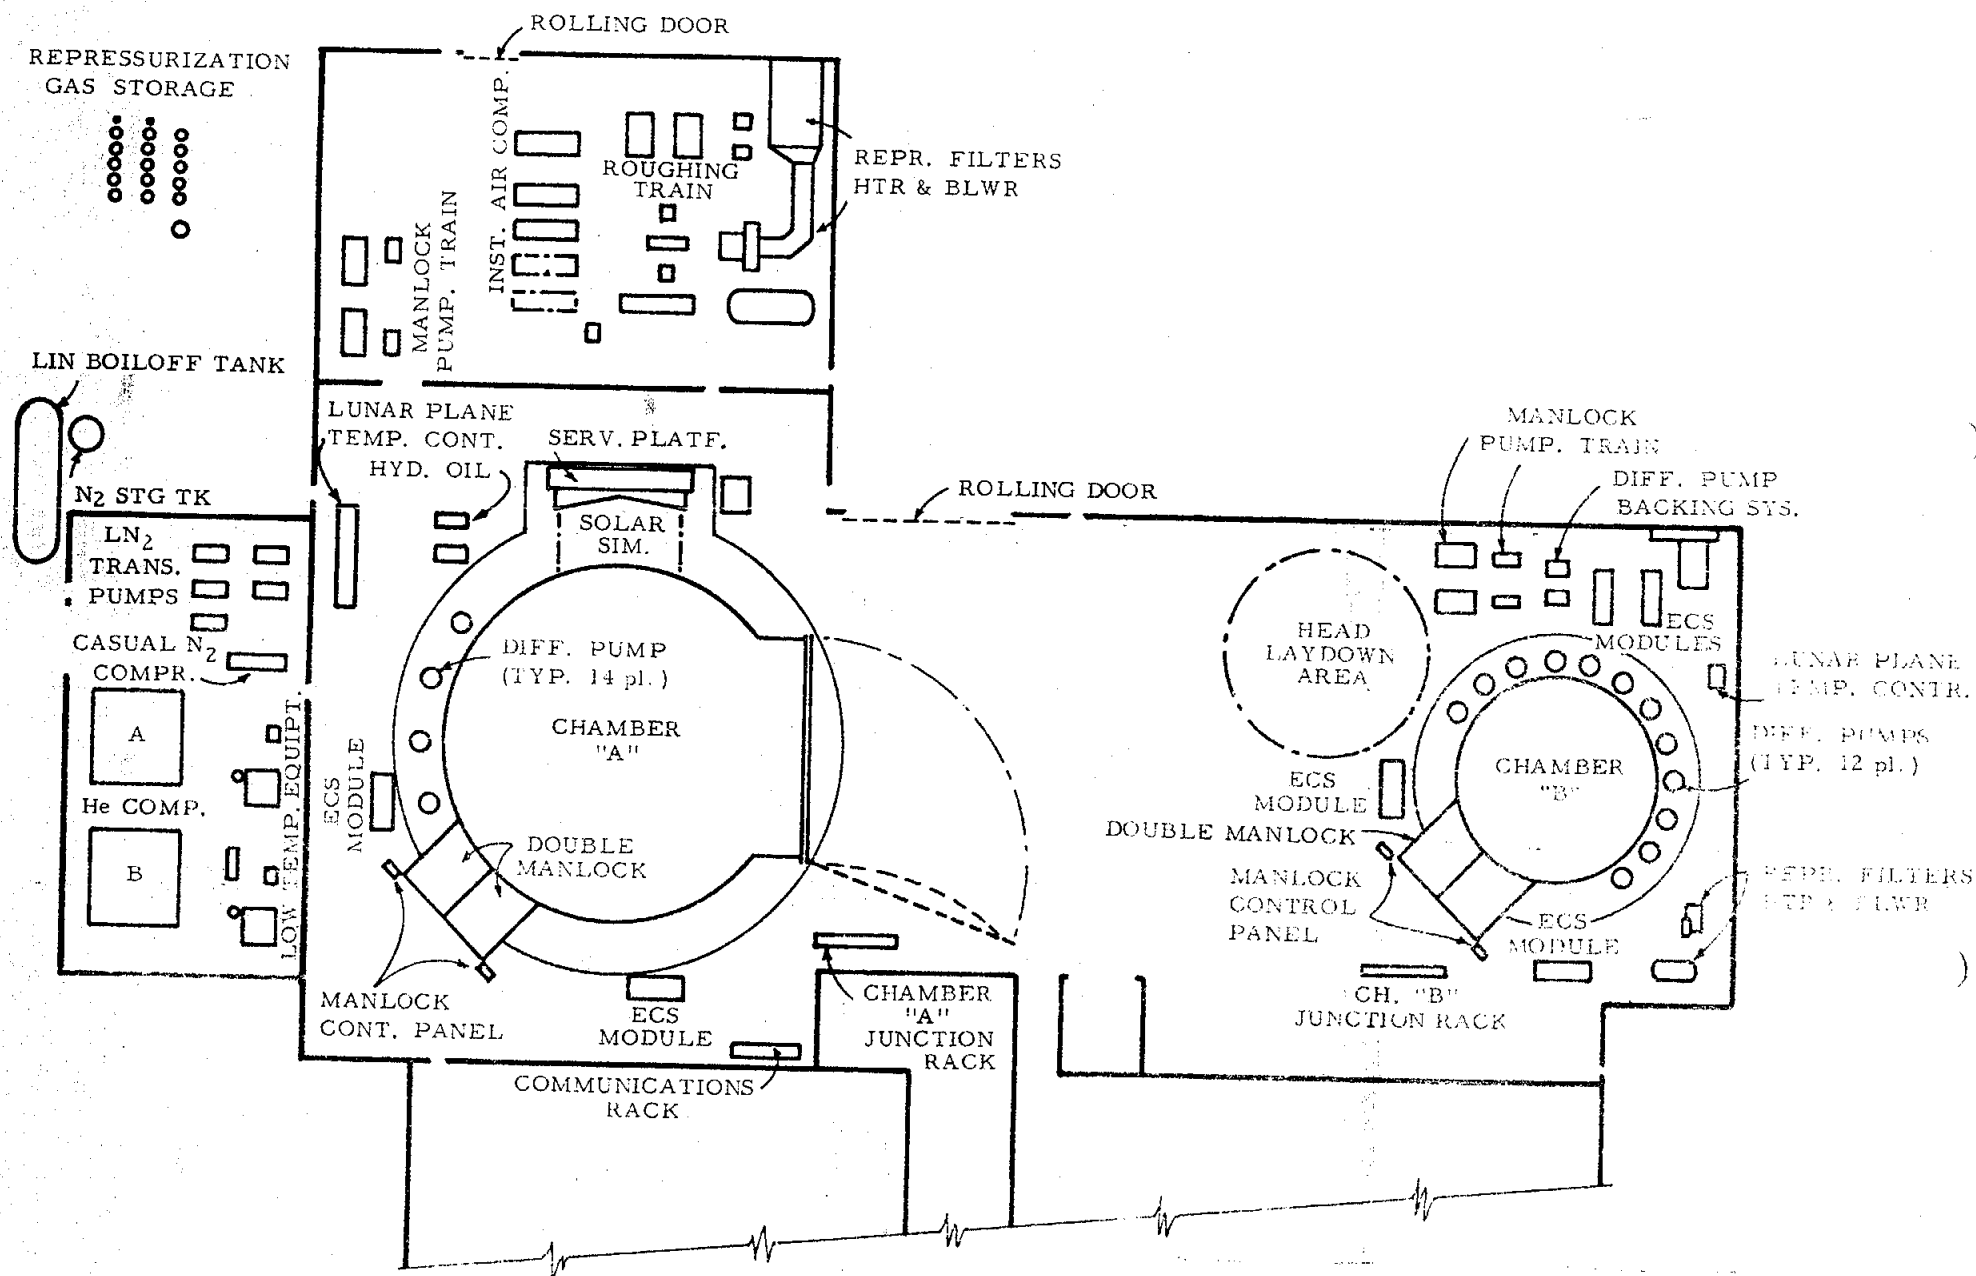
PLAN AT ELEVATION 0'-0" (GROUND FLOOR)
